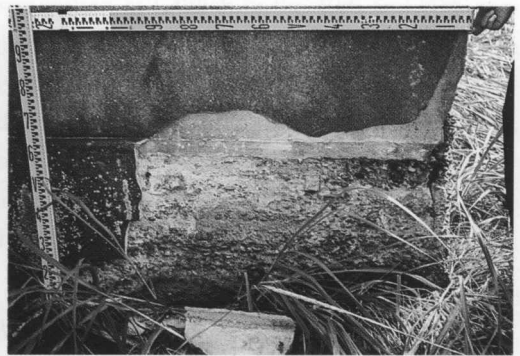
Delamination of mortar progressing on exterior wall face at the west side
